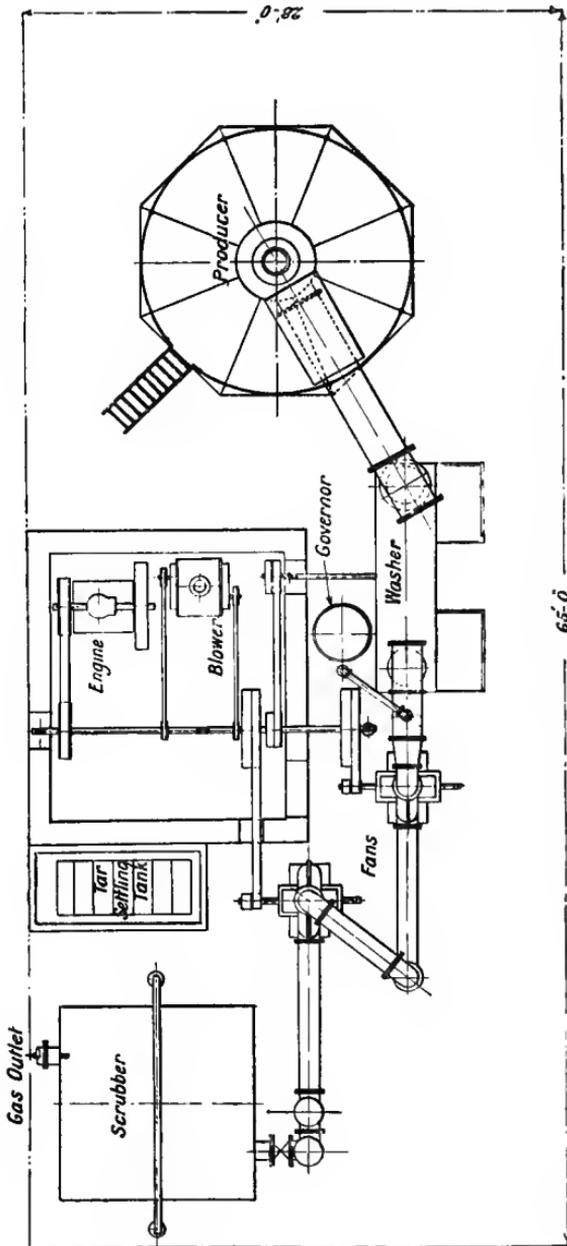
General arrangement of 600 B.H.P. Mond plant.
